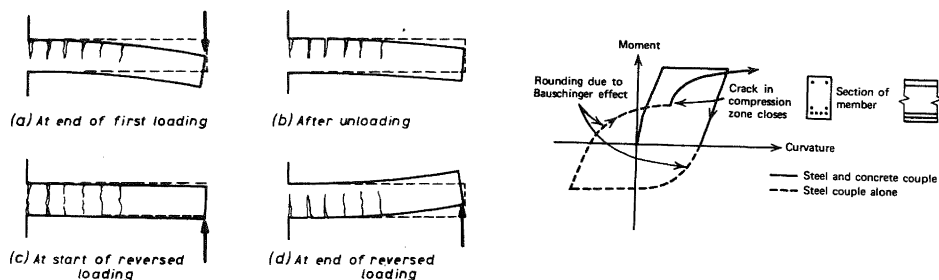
Effect of Reversed Loading on a Reinforced Concrete Cantilever Beam (6)
